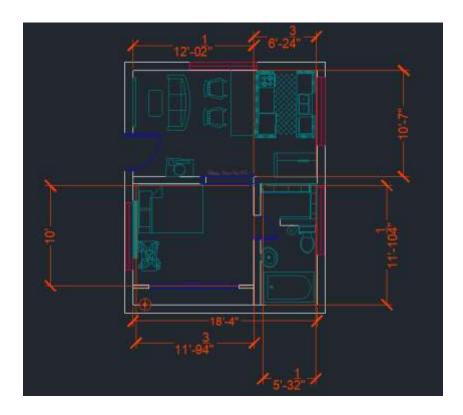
Floor plan of 500sq ft STUDIO APARTMENT (ii)
